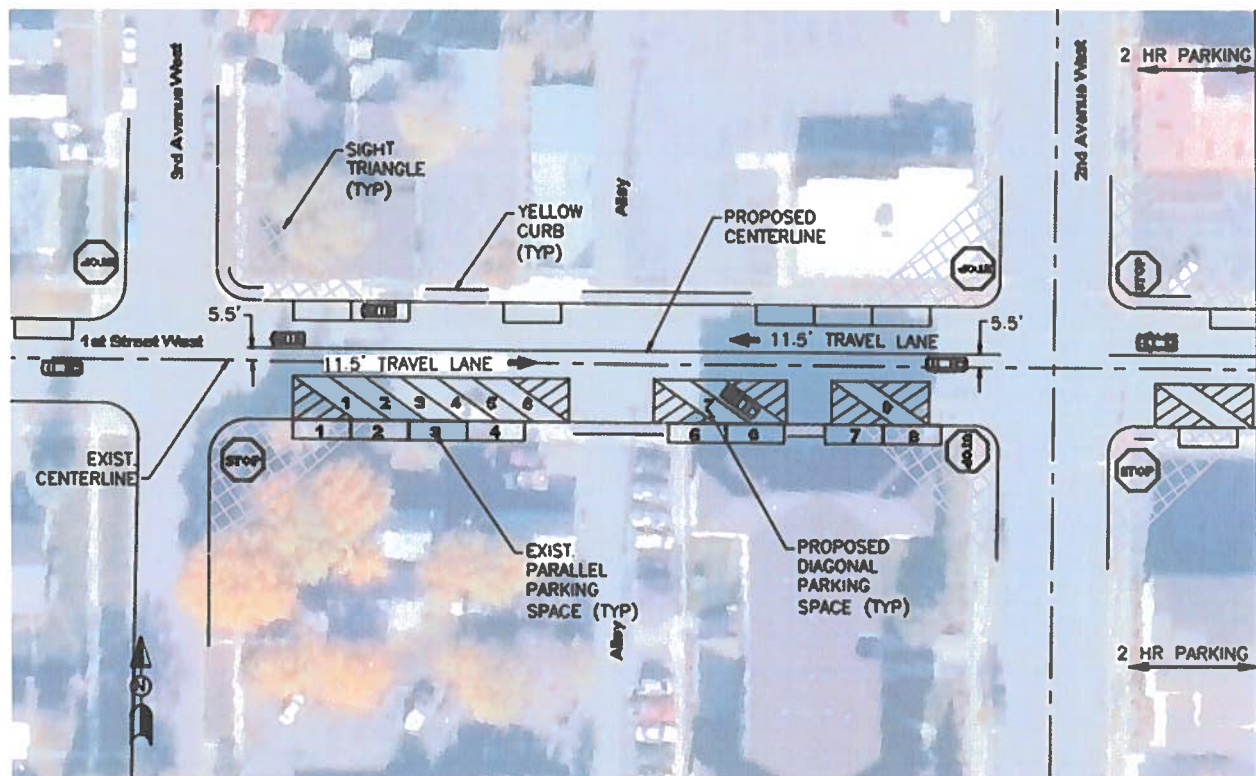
1st Street West / 3rd Ave West to 2nd Ave West
